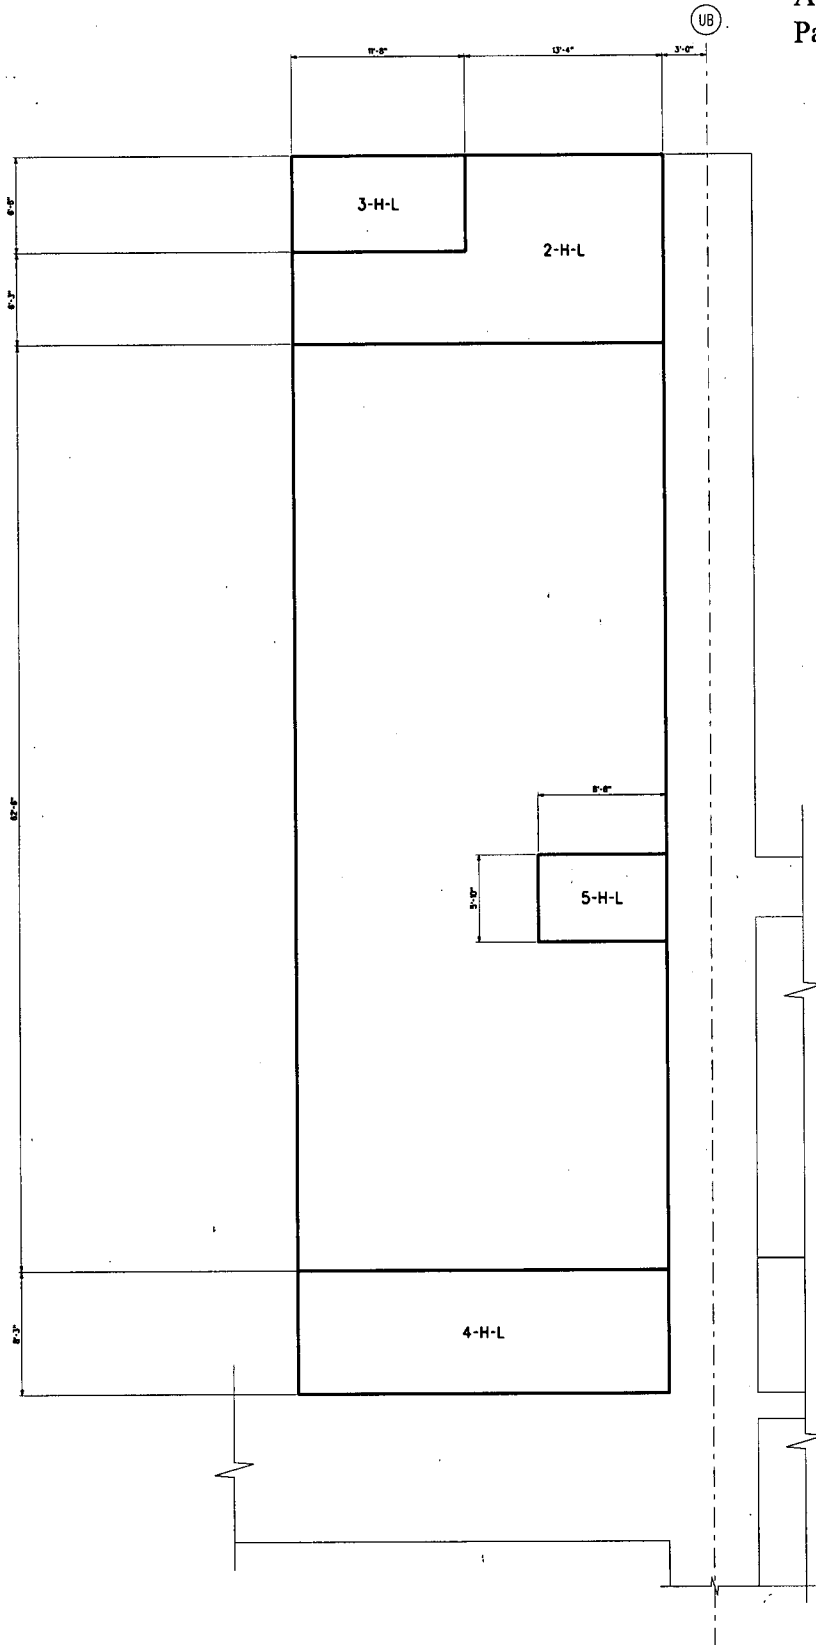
H.6-10B: BASIN/FAN WEST WALL LOOKING EAST
